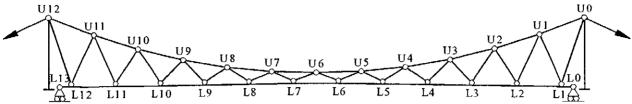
Model C — fully trussed two-hinged inverted arch with Warren triangulation.
